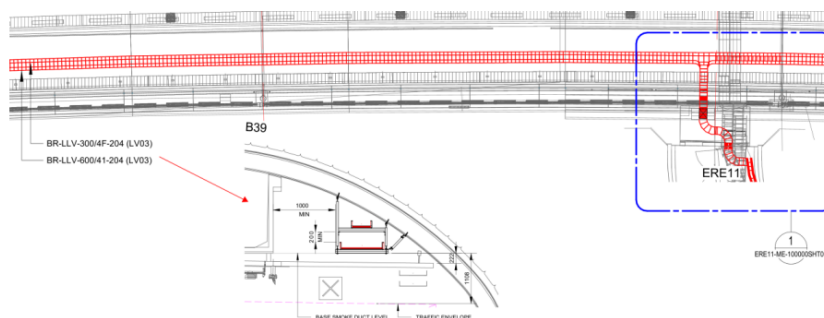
Final in-tunnel cable route design at a specific location for illustration.
